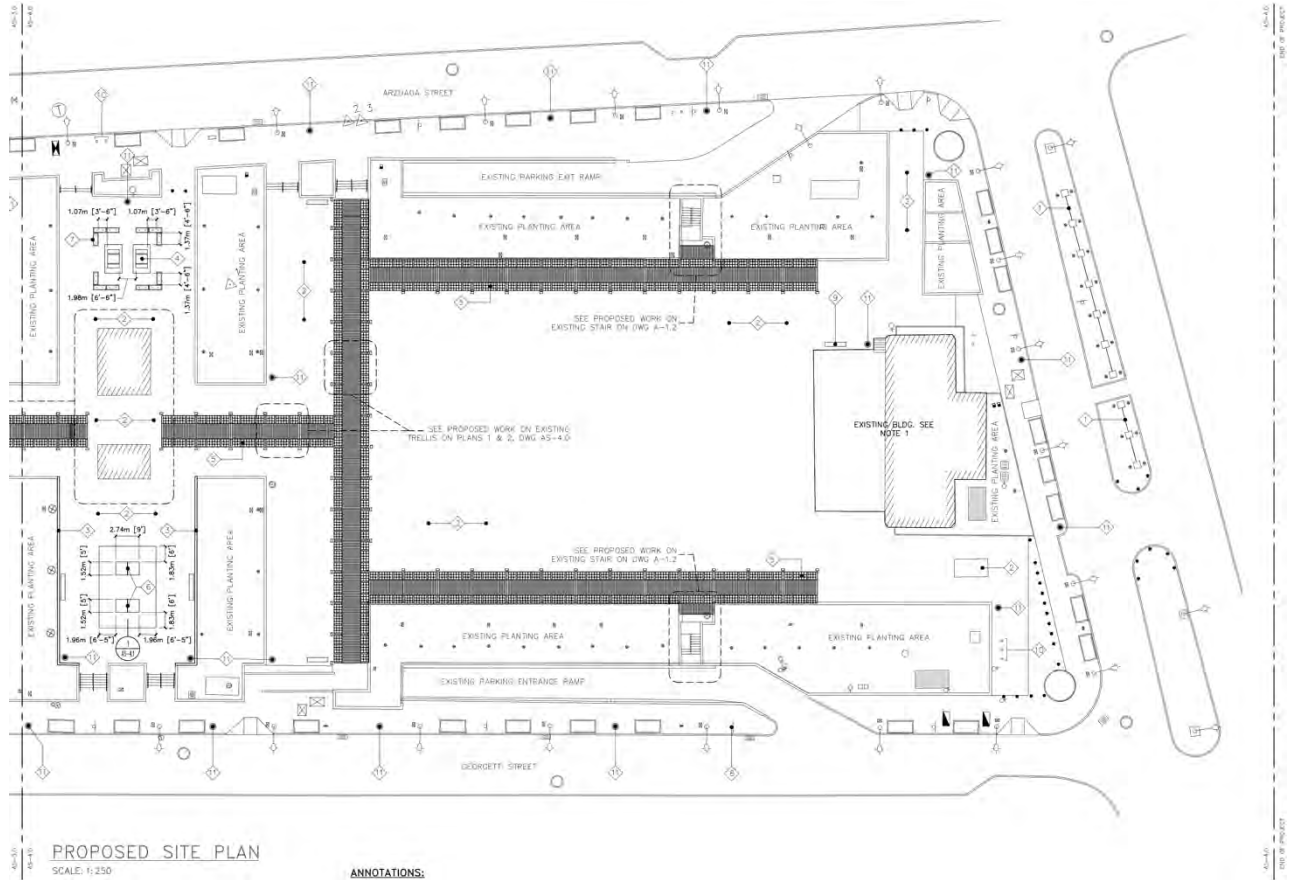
Proposed site plan for the east half of Plaza de la Convalecencia (Source: Drawing AS-4.0, Hernández-Bauzá PSC Architects, 2024).
